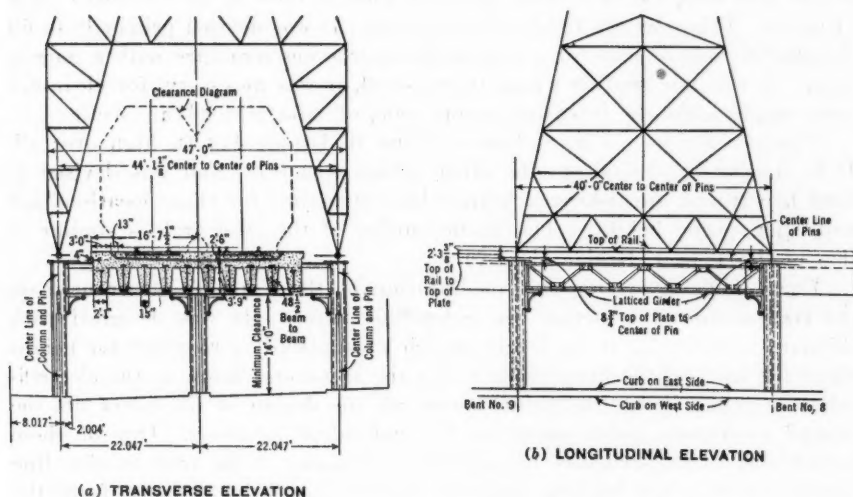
GENERAL DIMENSIONS OF A TYPE U BRIDGE STRUCTURE.
